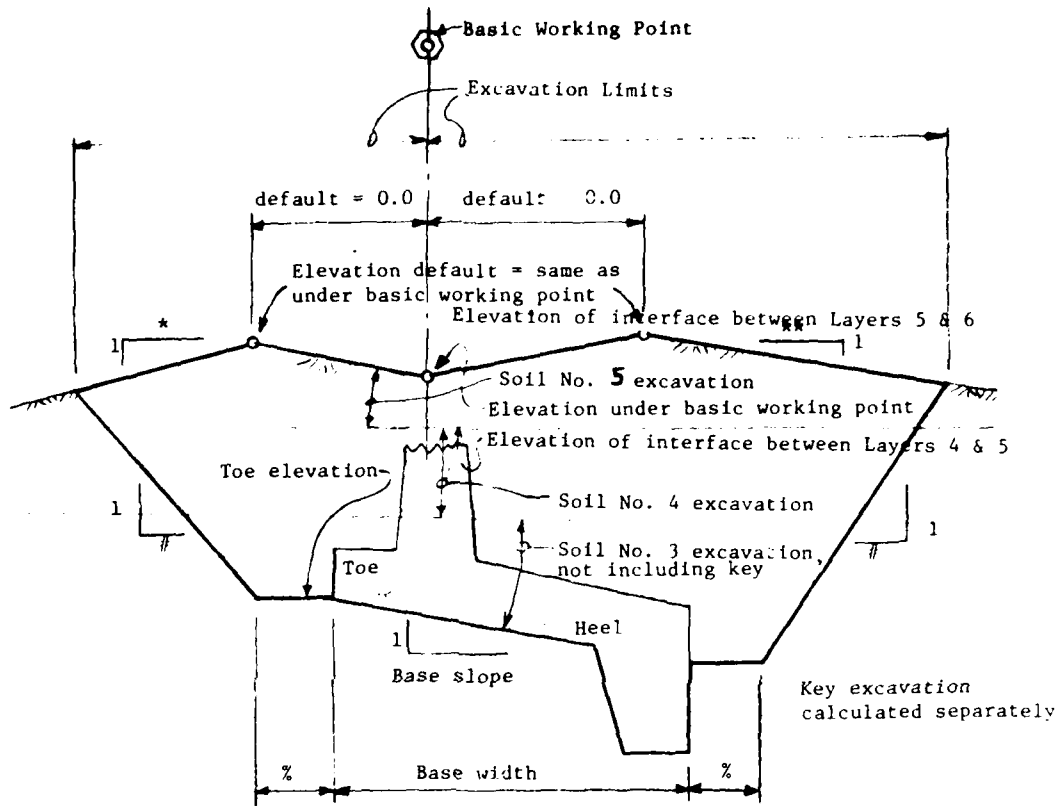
WALL CROSS SECTION WITH ILLUSTRATION OF ALL DEFAULT VALUES FOR HYDRAULIC STRUCTURES
